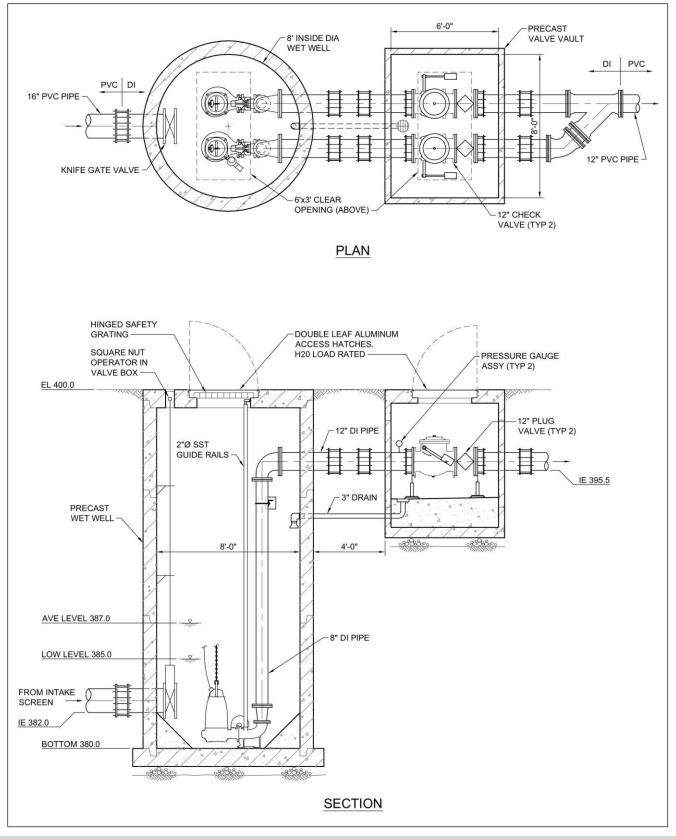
River Pump Station Wet Well and Valve Vault Plan and Section
